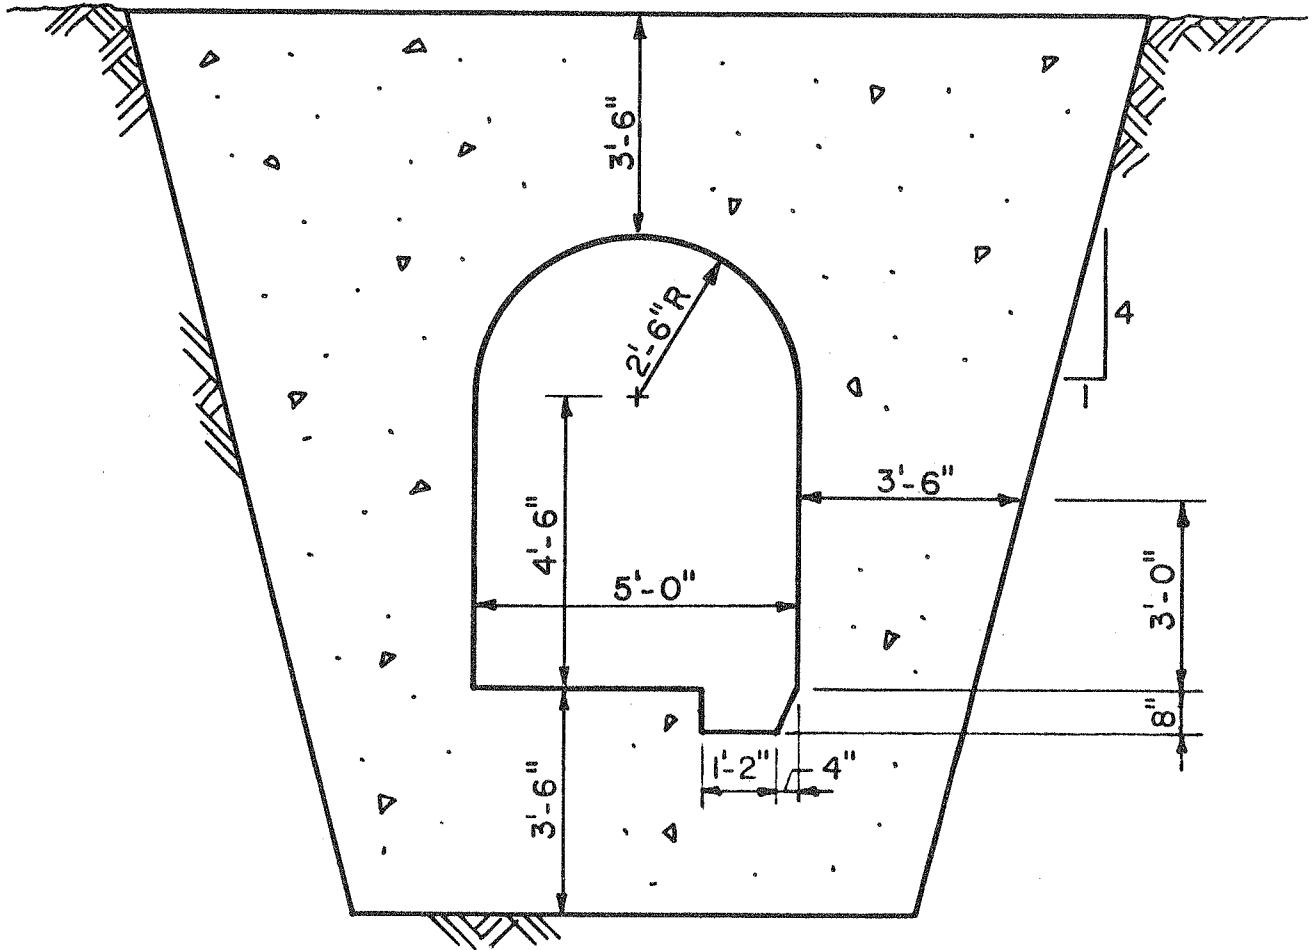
TYPICAL SECTION OF GROUT GALLERY
